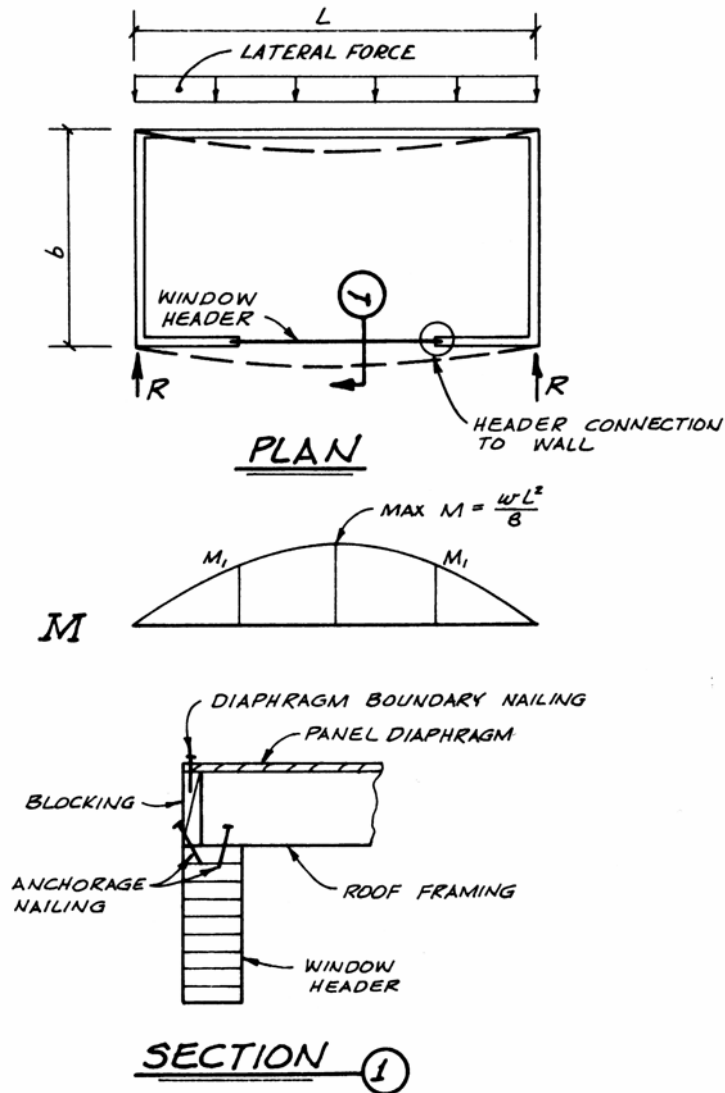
The header over an opening in a wall may be used as horizontal diaphragm chord.
